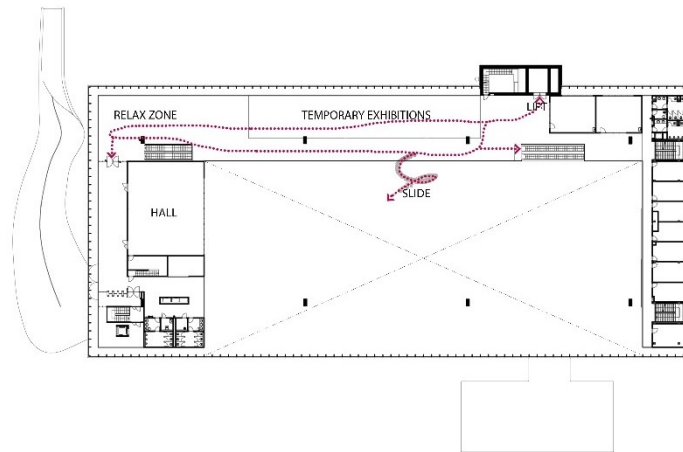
VIDA! Science Centre in Brno, Czech Republic: 1st Floor. (Source: Floor plan by K4 with markings by Filová, 2021)
